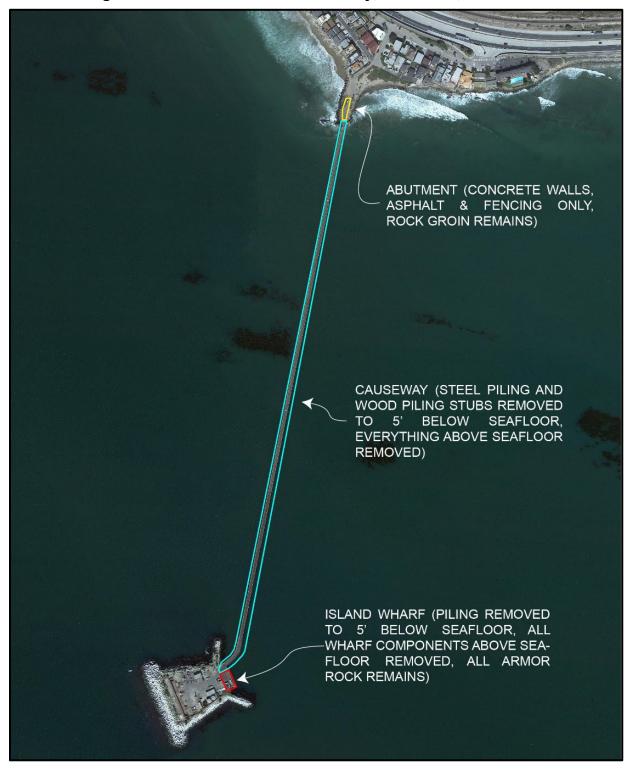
Rincon Island, Causeway, Abutment, and Wharf
